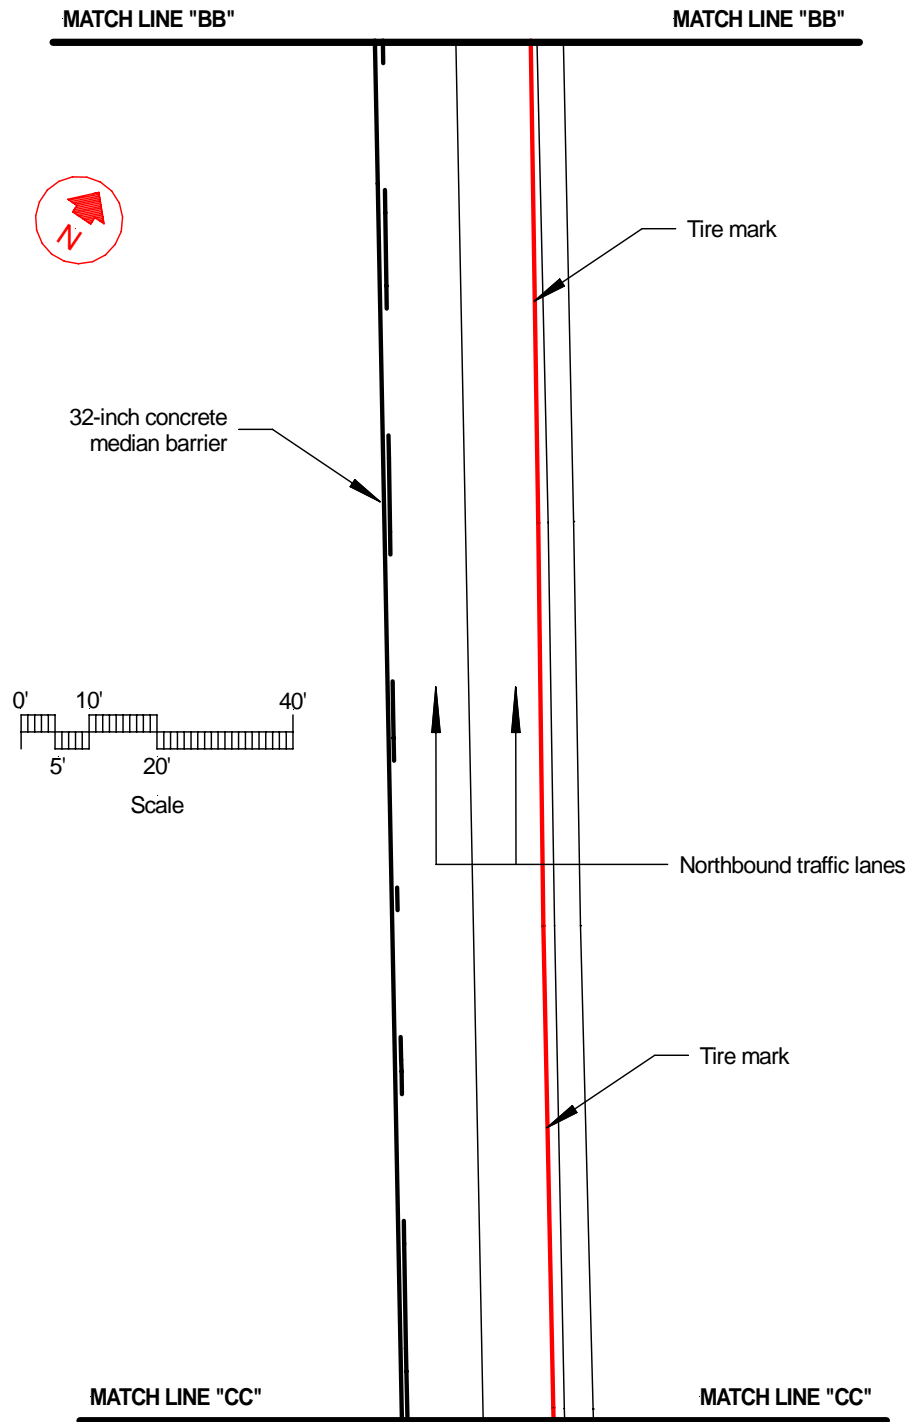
NTSB map of BB-CC pavement markings and roadway evidence.
